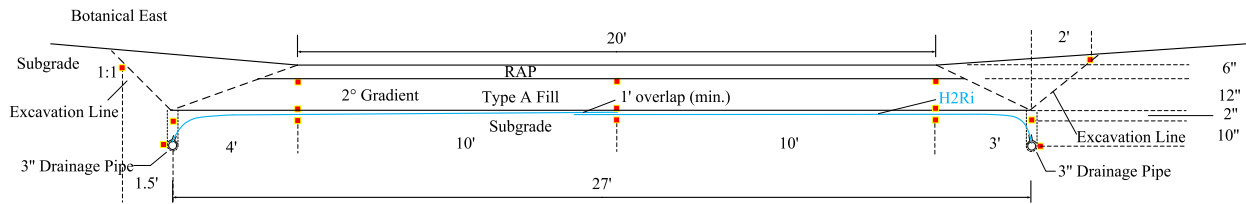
(b) shows the soil profile and sensor layout for Cross Section 3 on the east test area of the Yukon Drive. This test area was the control section without the H2Ri wicking fabric. The sensor layout in Cross Section 3 is similar to that in Cross Sections 1 and 2. Figure 3.3(c) shows the soil profile and sensor layout for Cross Section 4 in which the H2Ri wicking fabric was installed. Different from the design on the west side, both ends of the H2Ri wicking fabric were inserted into a 3-in. diameter drainage pipe. Besides this, the sensor distributions in Cross Section 4 were the same as those in Cross Section 3. Figure 3.5 further shows the design of the drainage pipe. There shall be at least a 6-in. overlap for the H2Ri wicking fabric. The wicking fabric was sandwiched by two layers of woven geotextile to prevent contamination. The 3-in. diameter HDPE drainage pipe was buried 12 in. below the subgrade and the excess H2Ri wicking fabric was stuffed into the pipe to prevent from yanking out.
